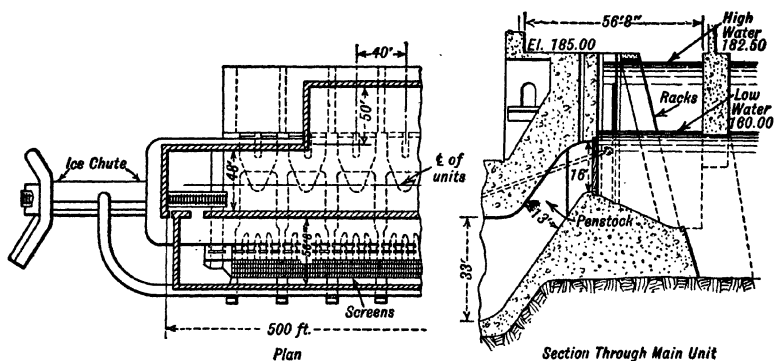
Showing Use of Outside Baffle Wall at Holtwood (McCall's Ferry), Susquehanna River, Pa., for Diverting Ice.
